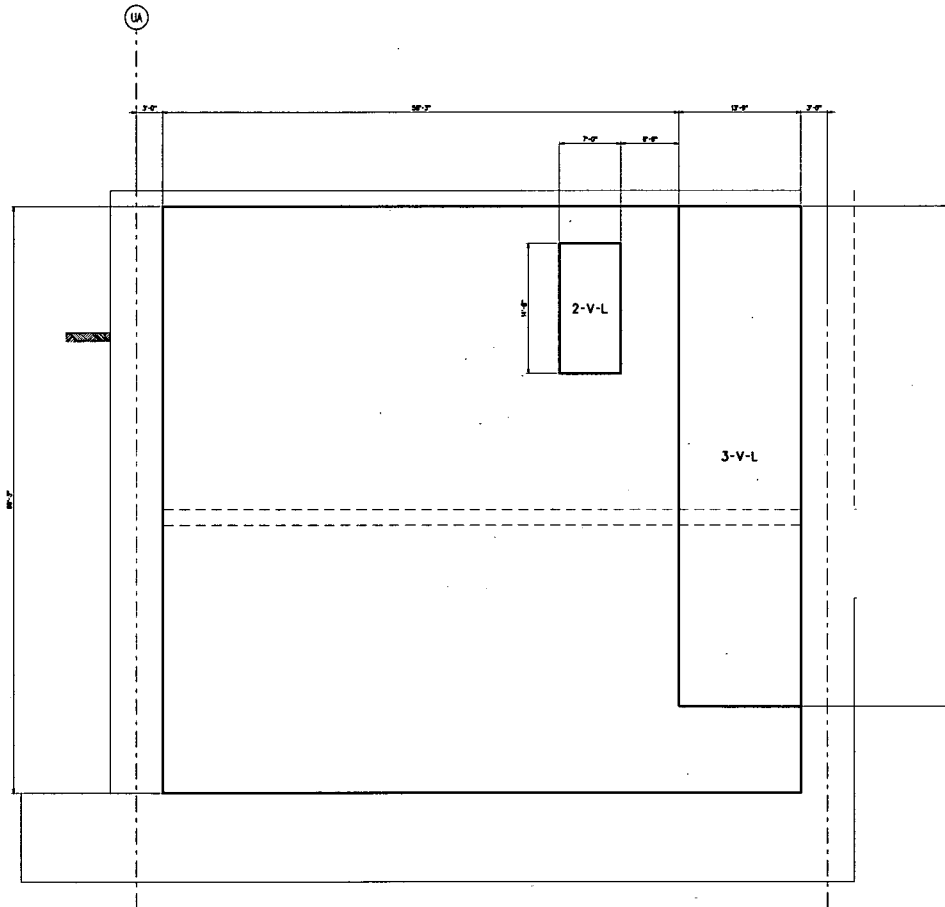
H.6-68: PUMPHOUSE WEST WALL LOOKING EAST
